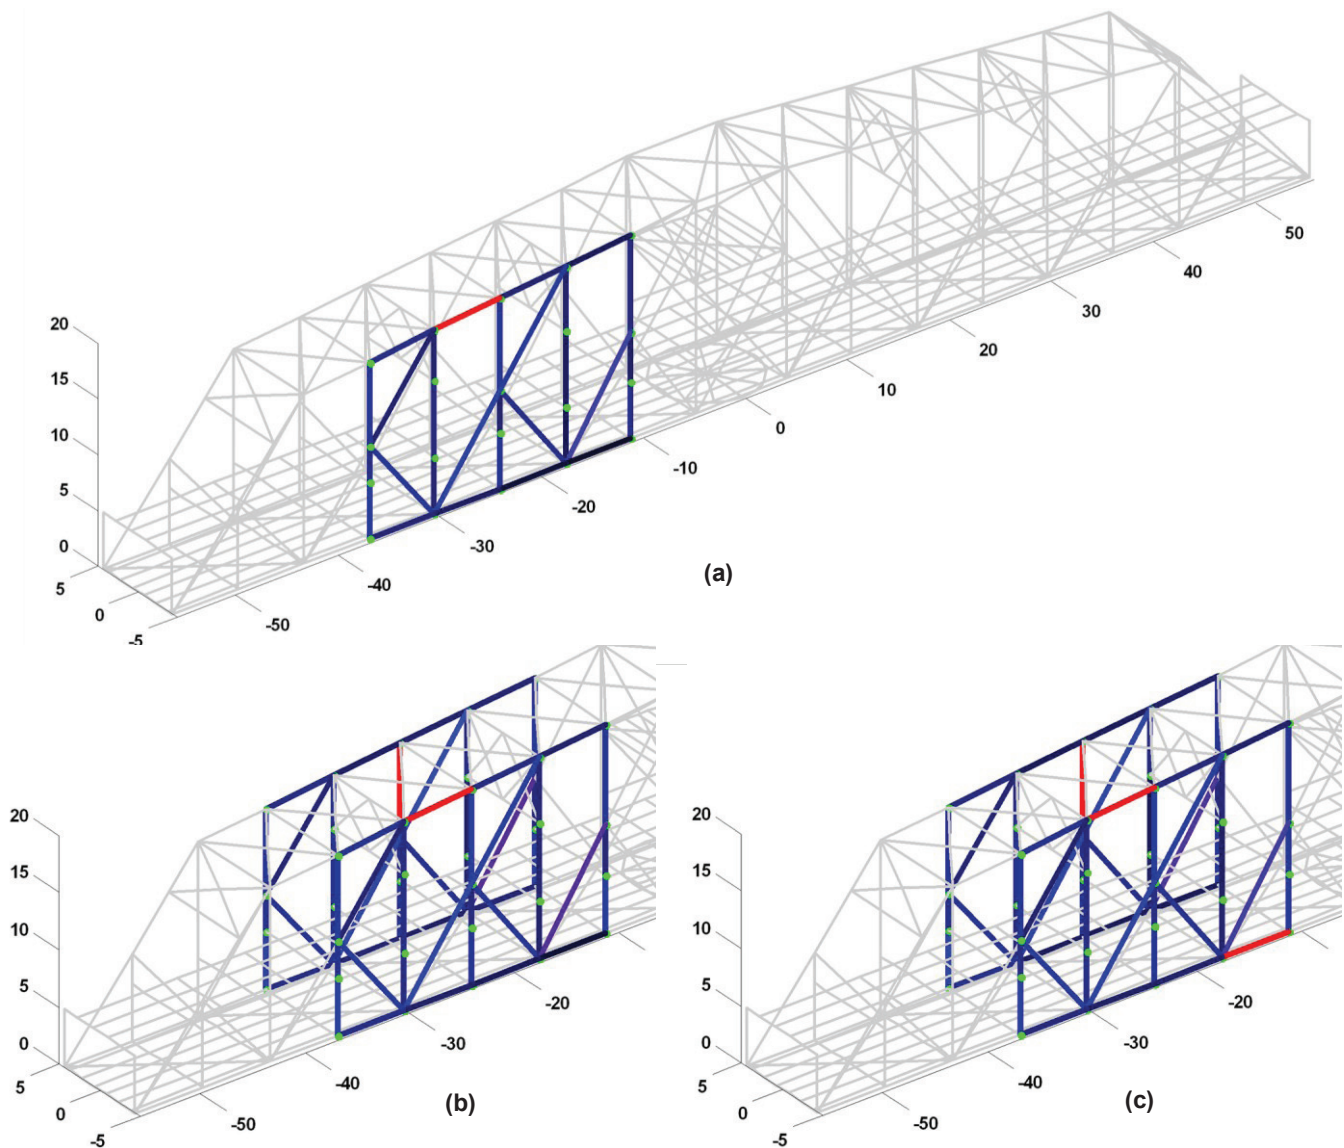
Damage Index for elements included in measured group such that a red element are damaged elements, blue elements are undamaged elements, grey elements are unmeasured elements, and the green dots indicate the sensor locations for the following cases: (a) 10% reduction in one element and measured on one plane of the truss (b) 5% reduction in two elements on opposite planes of the truss and measured on both planes and (c) 5% reduction in three elements and measured on both planes of the truss
